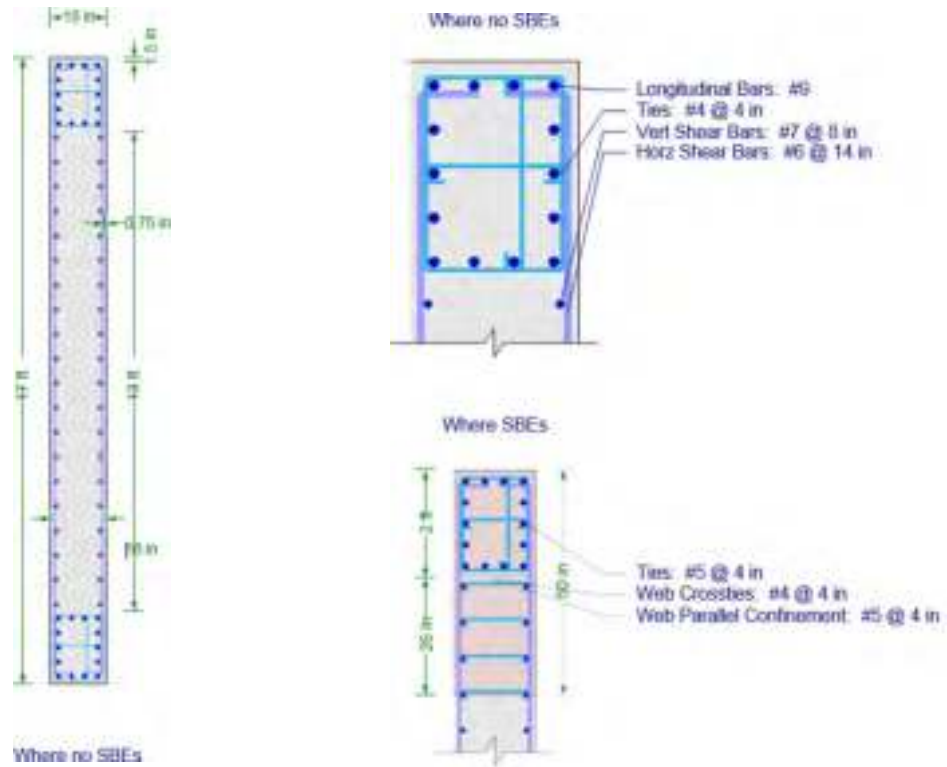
Building (B10-12S-M-S) Special RC Shear Reinforcement Details; Wall Section for Floors 1-3
